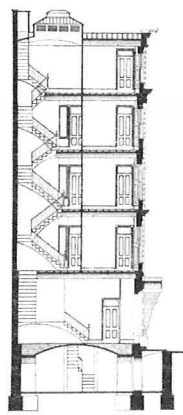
RUNKING HOUSE, FIRE-PROOF TENEMENT HOUSE, NEW YORK CITY.
